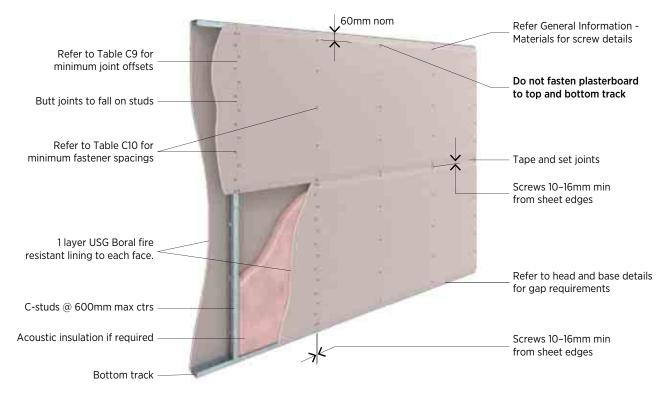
Fire Rated Steel Stud - Horizontal Fixing - Single Layer
